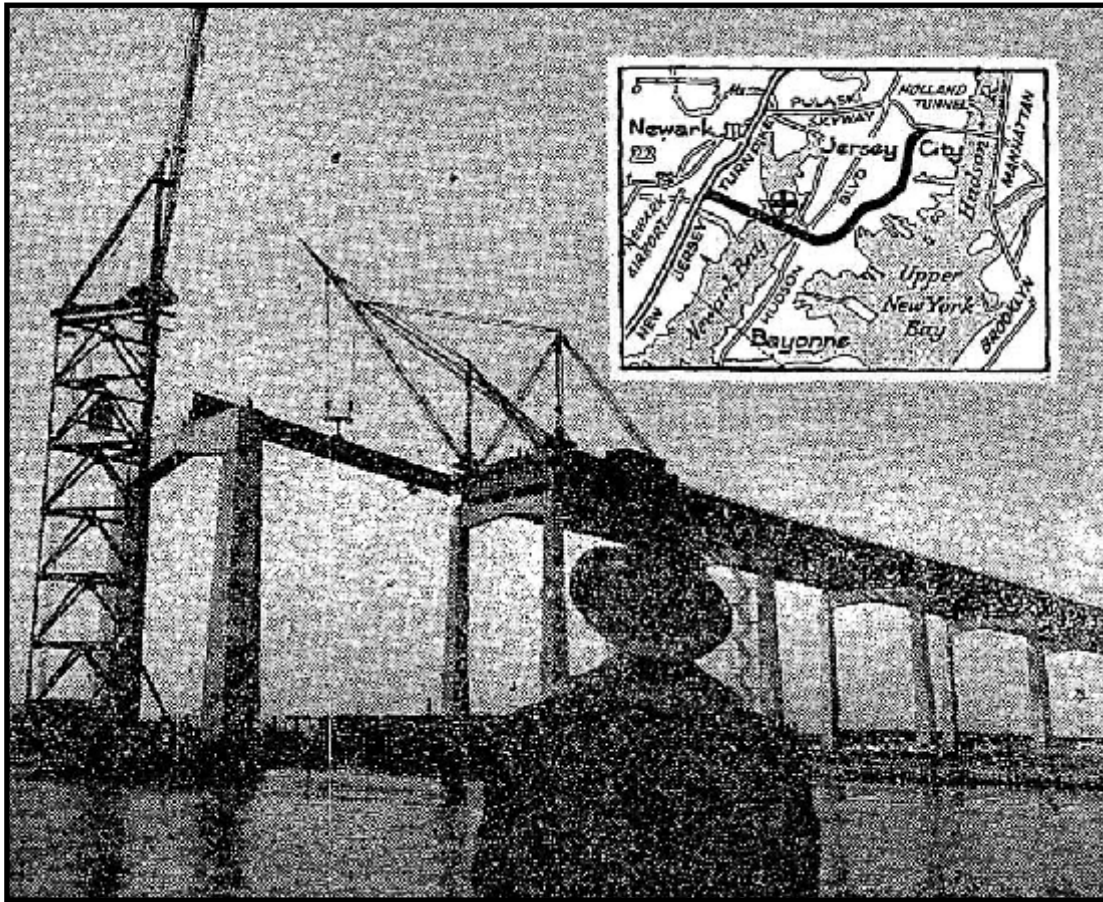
1955 newspaper photograph depicting the positioning of the last two girder spans on the west approach. Construction utilized both a traveling crane and a floating tower crane (NYT February 15 1955a: 29).
